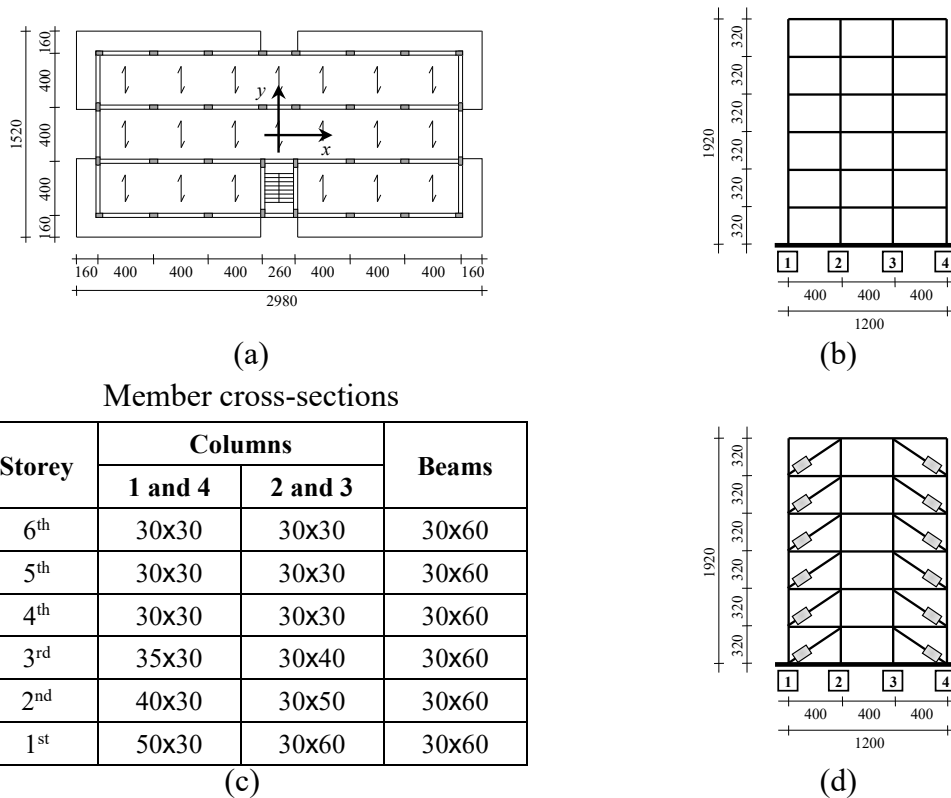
Analysed system: (a) plan layout of the building, (b) structural scheme of the bare frame, (c) RC member cross-sections and (d) structural scheme of the upgraded frame.
